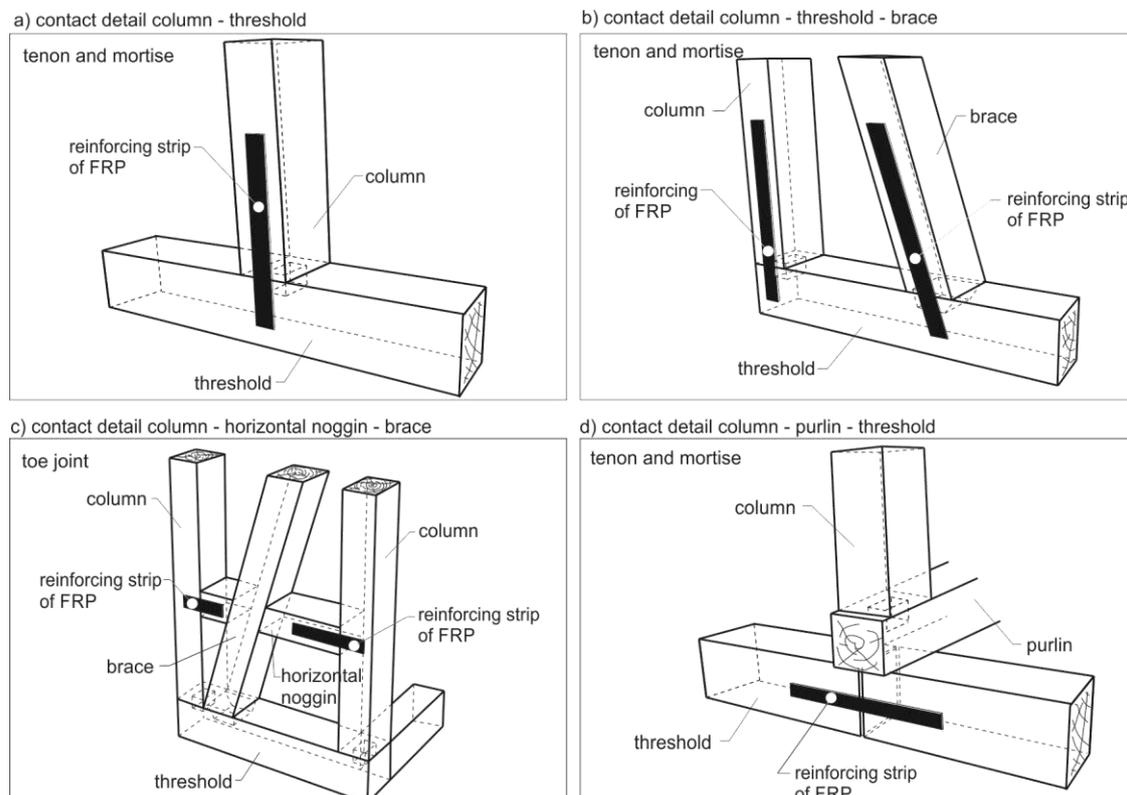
Surface application of FRP fabrics for strengthening carpentry joints of half-timbered constructions
